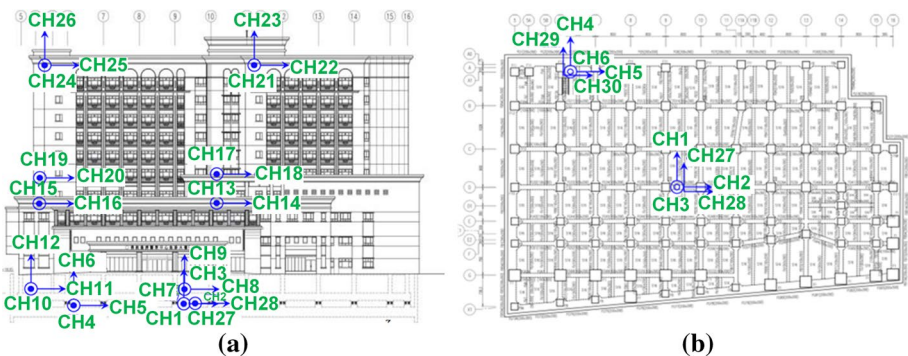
Layouts of seismic instruments in a elevation and b floor plan of B2F
